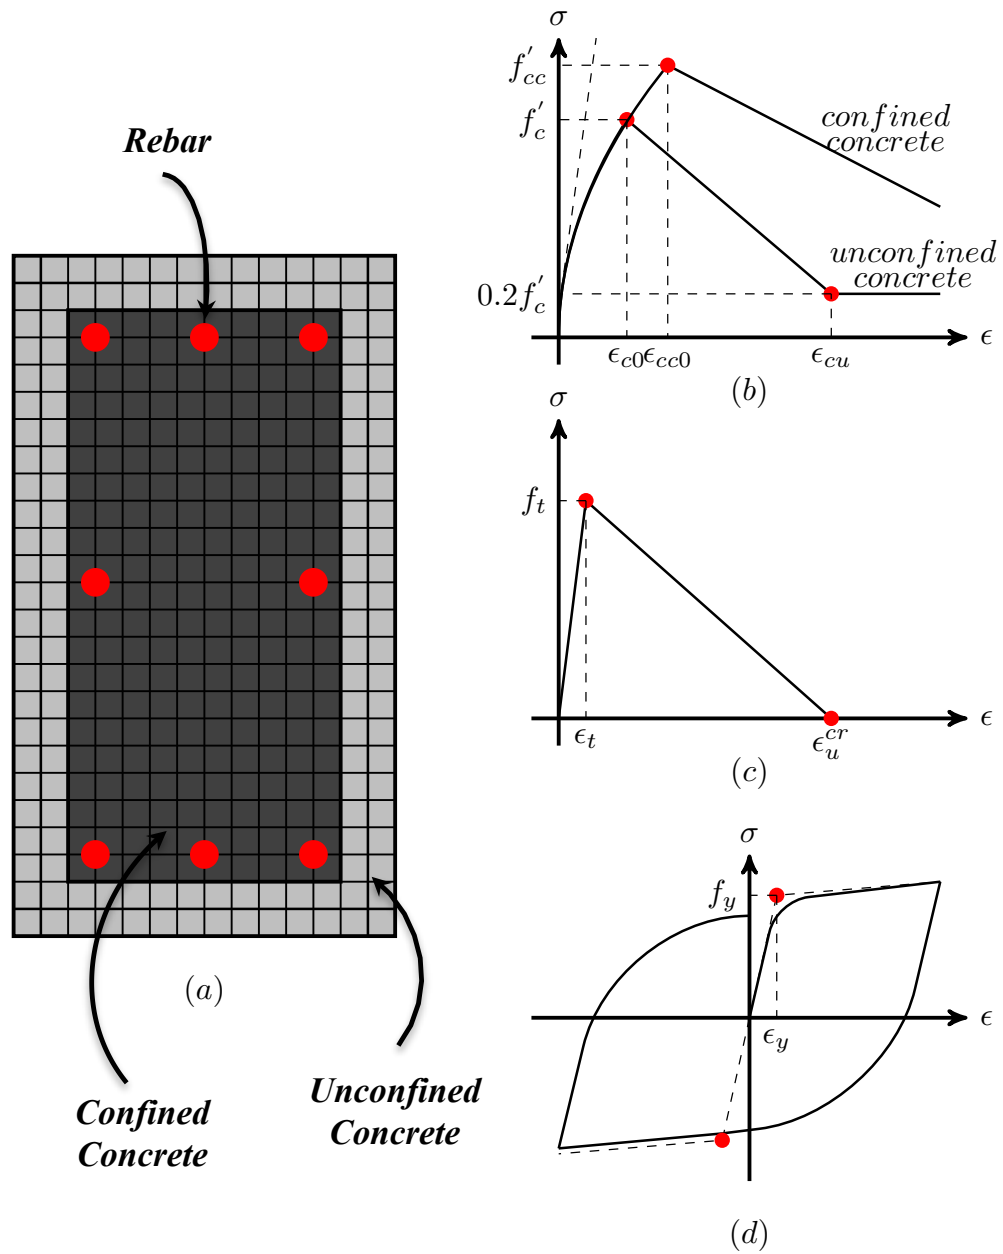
(a) Reinforced concrete fiber section discretization, and material stress-strain response (b) concrete in compression, and (b) concrete in tension, and (d) steel reinforcement.
